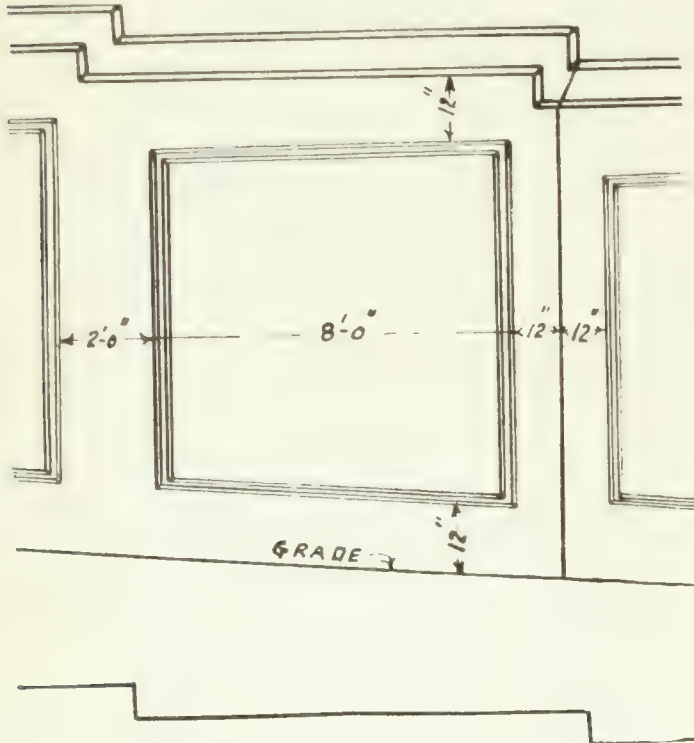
Detail of Panelling of Wall, also Showing Location of Expansion Joint.
